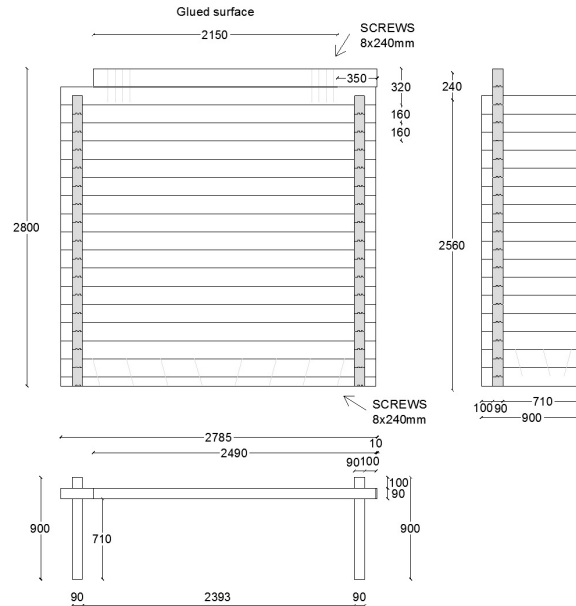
Dimension of M/C_ST_SH wall specimen.
